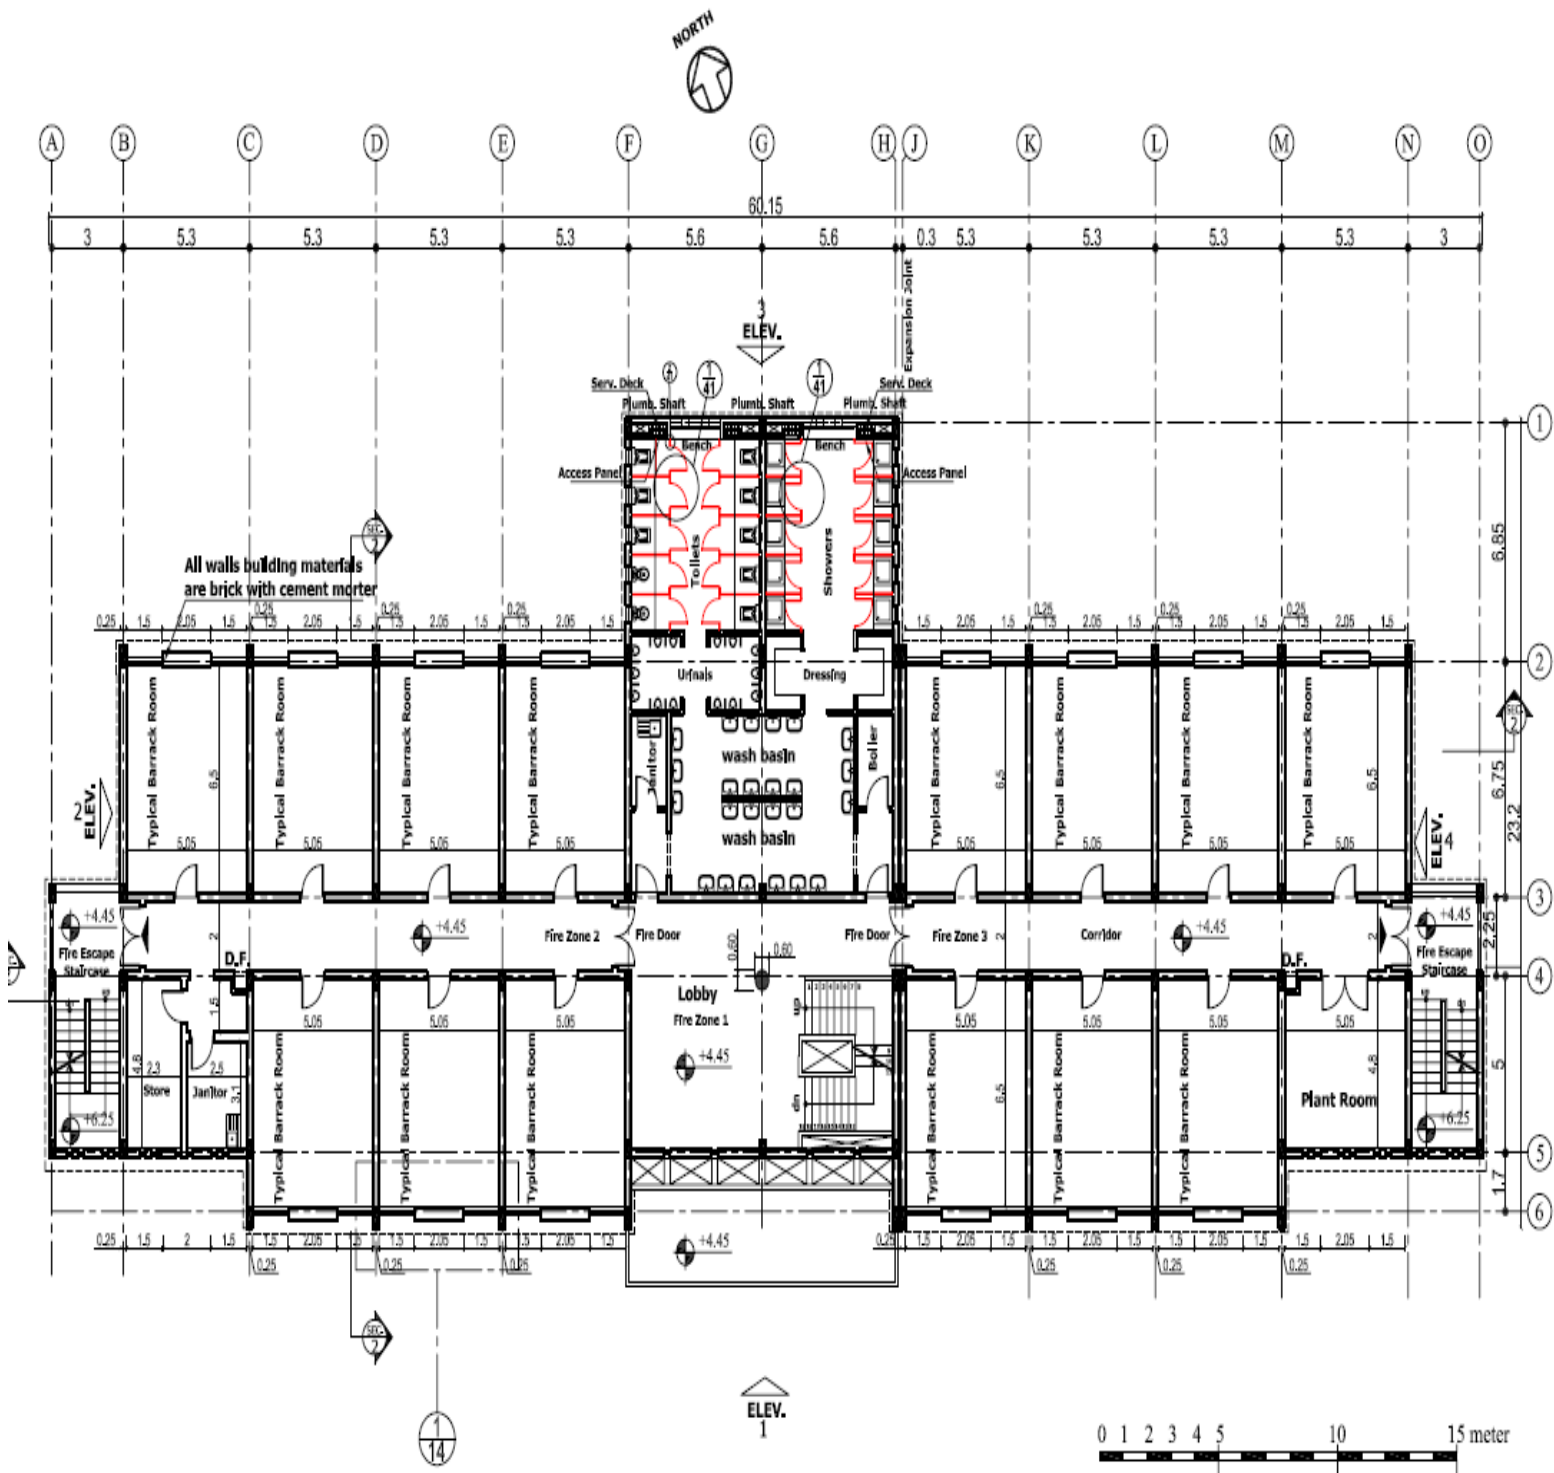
2nd and 3rd story floor plan of cadet barracks building
